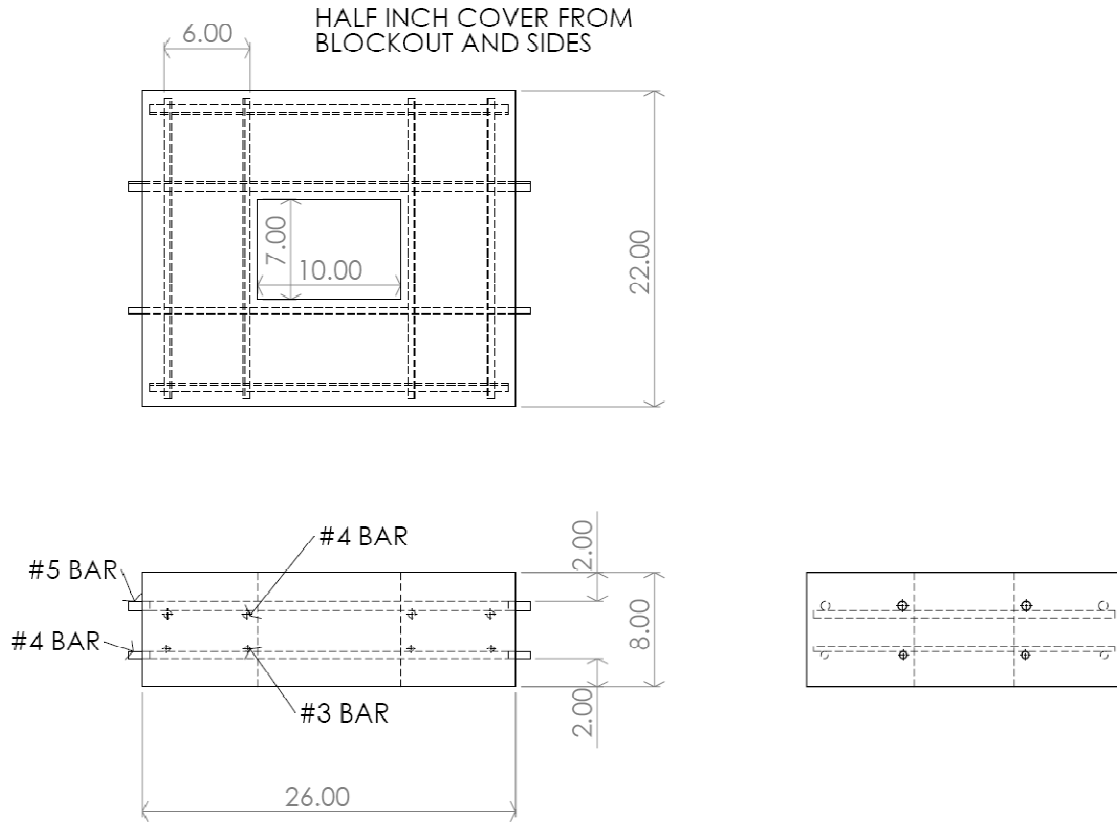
Typical Reinforcement Layout of Precast Shear Deck Specimens.
